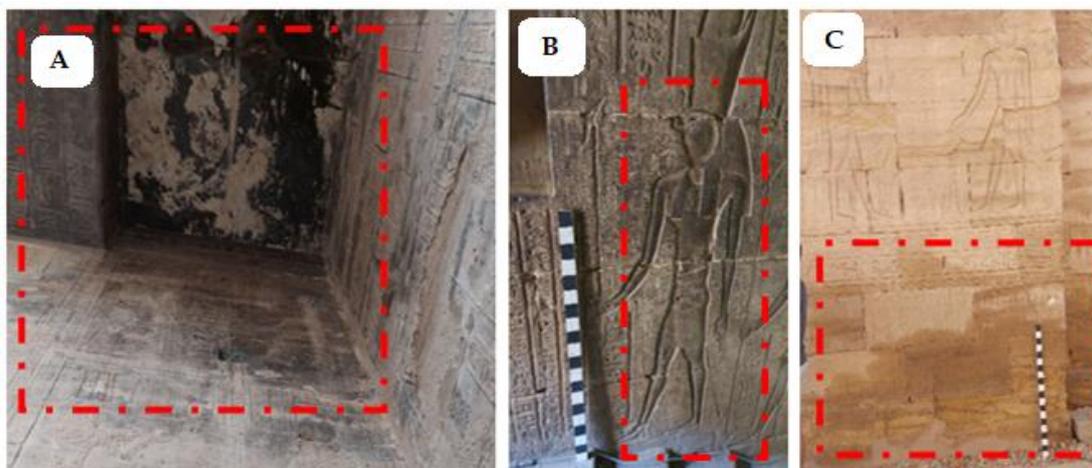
Some deterioration forms on the wall reliefs of Edfu temple, A, B) Soot damage on the ceiling and temple walls, C) Moistened walls with adhered soiling materials.
